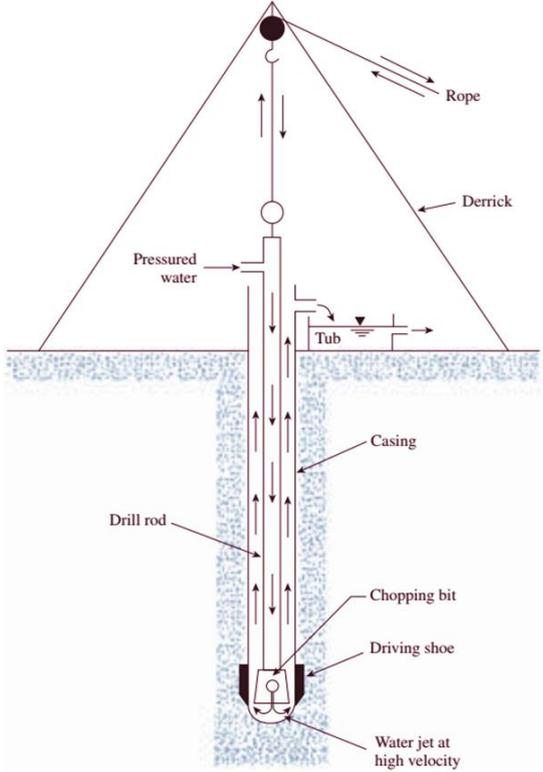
Outline of Wash Boring (Ref: Geotechnical Engineering by B M Das)
